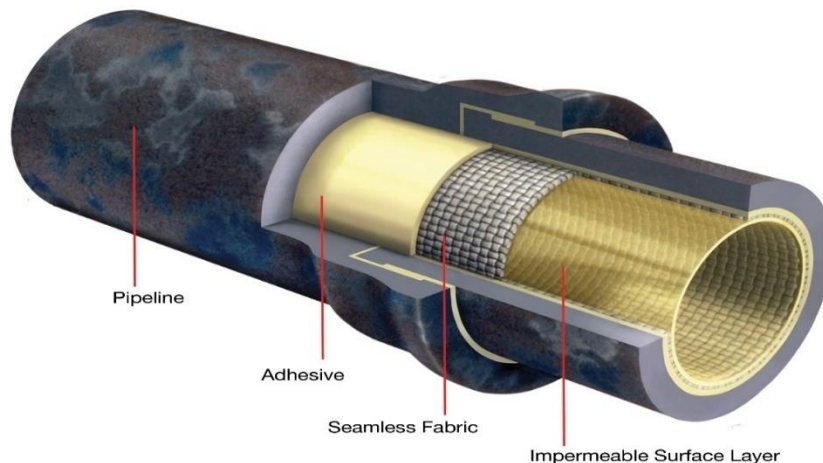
Schematic representation of a pipe section treated with trenchless technology (bing.com trenchless technology)
